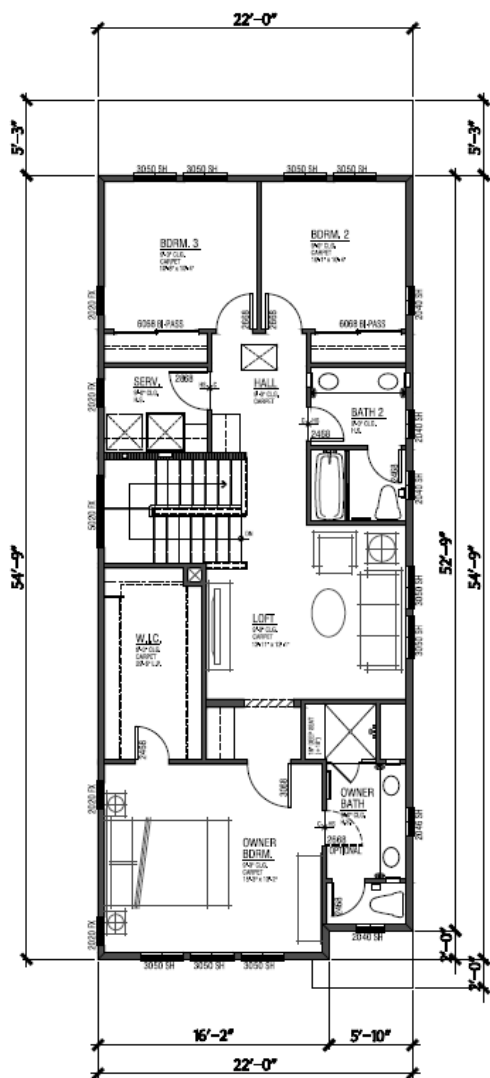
Conceptual Elevations and Floor Plans- Plan 1
